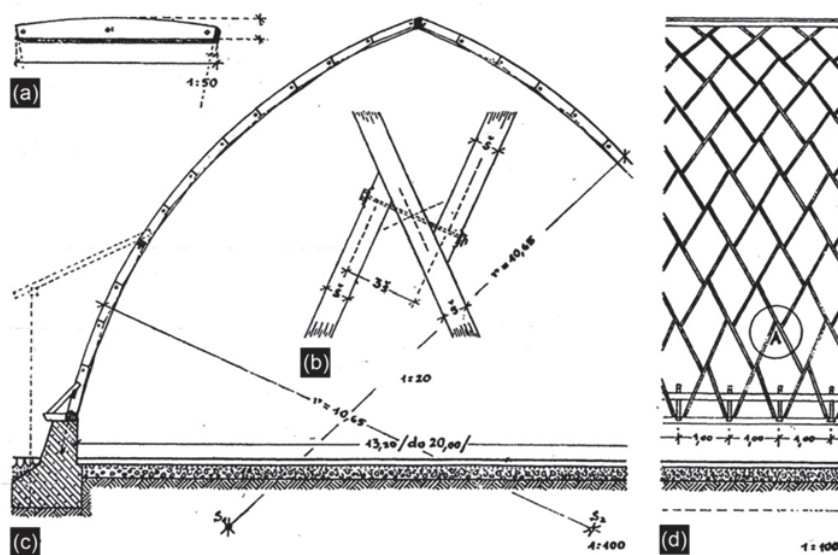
Zollinger lamella roof design: (a) lamella detail with dimensions, (b) joints of lamellae, (c) transverse section and (d) longitudinal section of the roof for housing [6].
